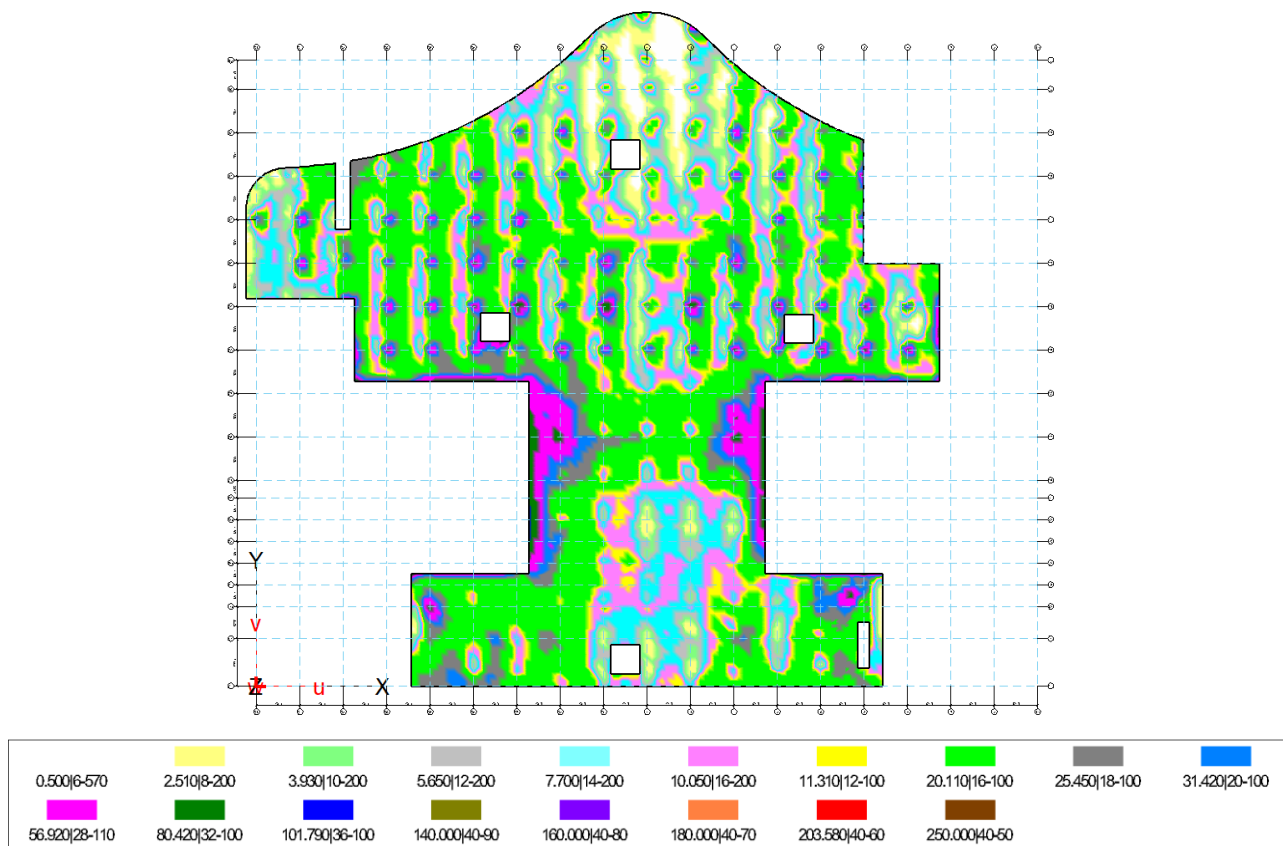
Reinforcement of the foundation plate. Lower longitudinal reinforcement in the direction of the axis R, cm^2/m [15]
